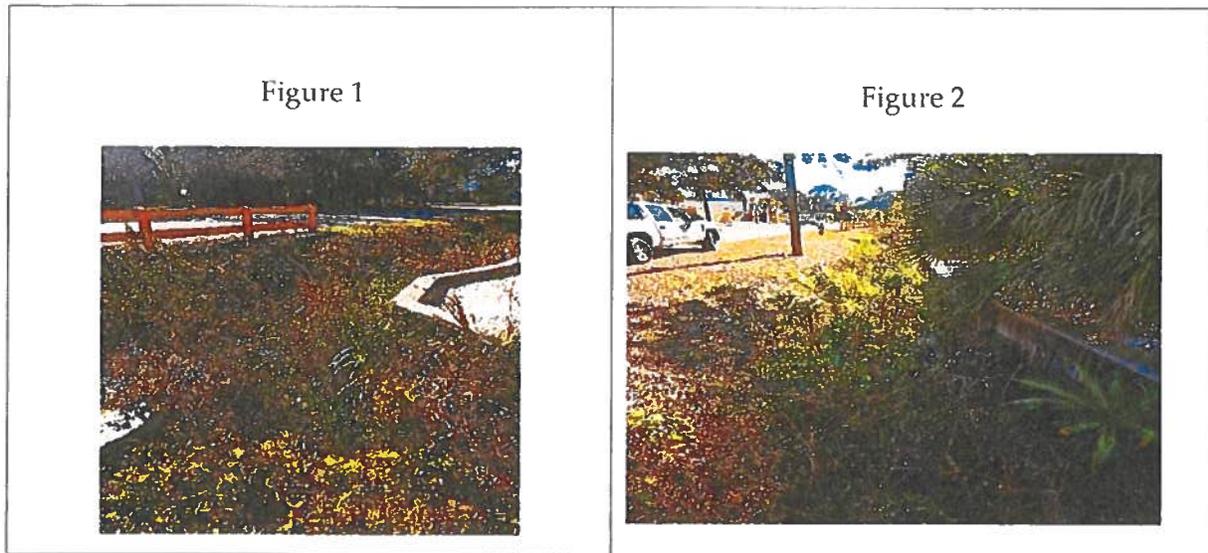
Looking West At North West Corner of Miller Avenue & 6<sup>th</sup> Street
